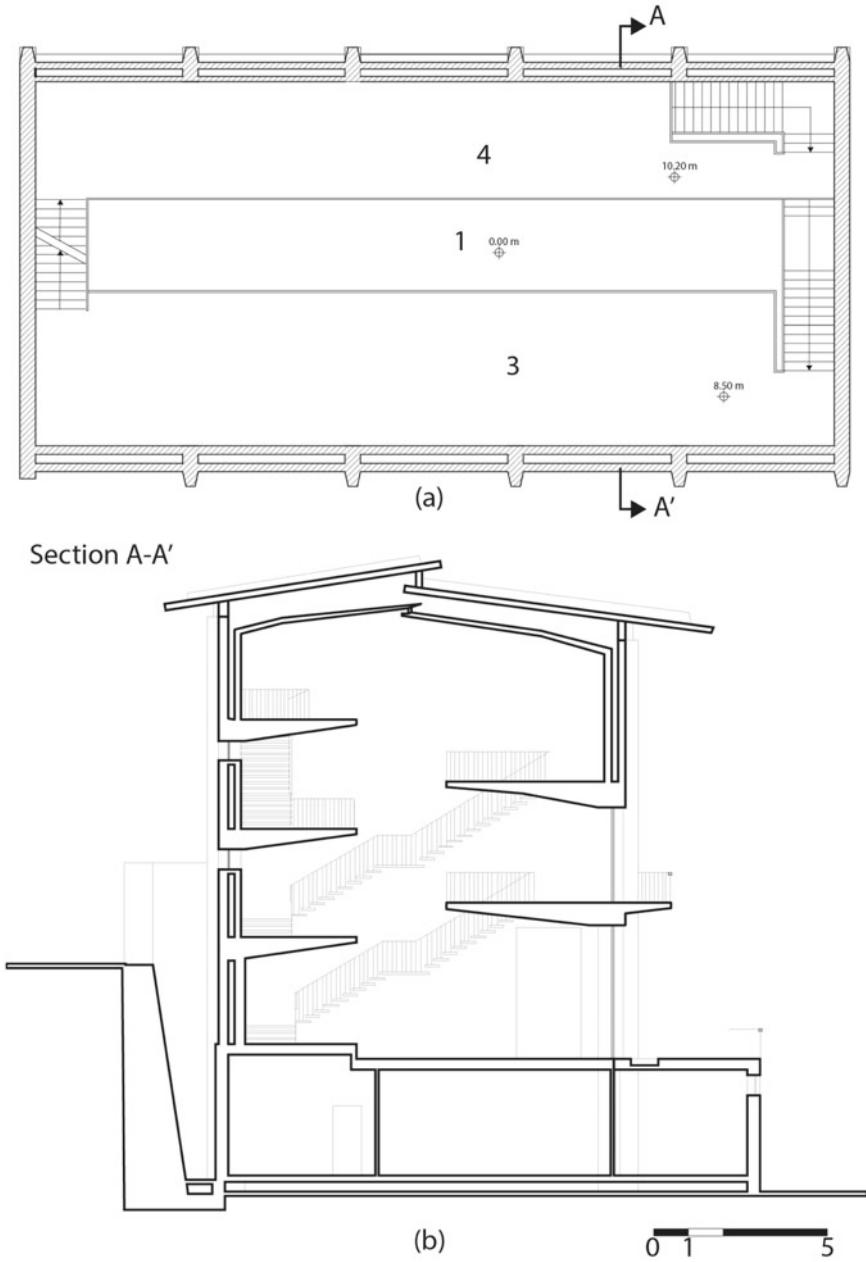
The 1955 project: a plan; b section (Drawing: A. Meloni)
